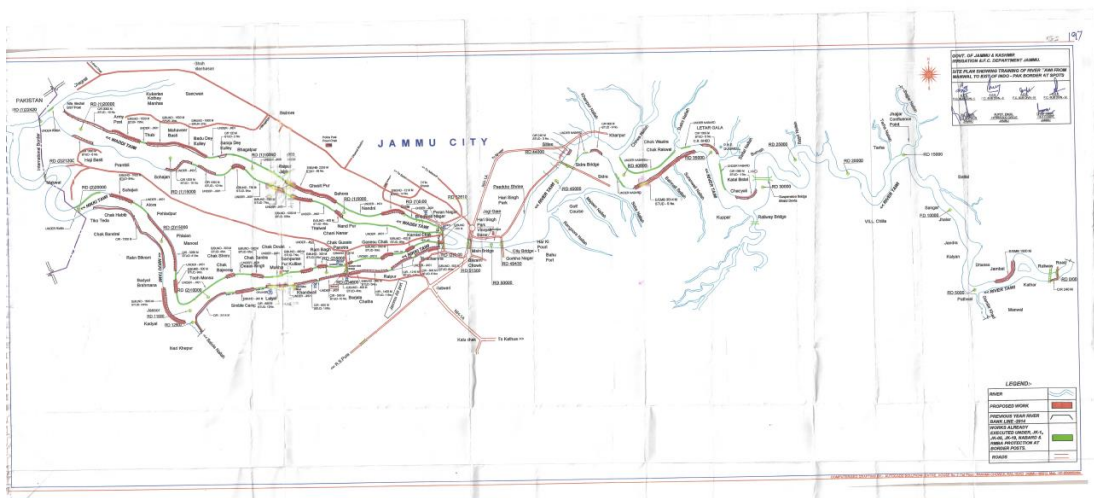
Site Plan of existing and proposed training river works in Tawi River from Manwal to exit of Indo-Pak Border at Spots.
